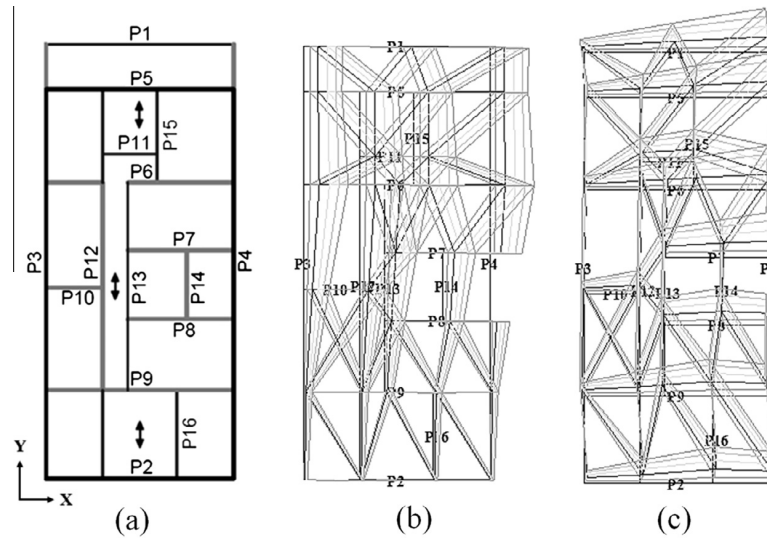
Modal shape: (a) plan undeformed shape, (b) 1st mode with translation in X direction and (c) 1st mode with translation in Y direction.
